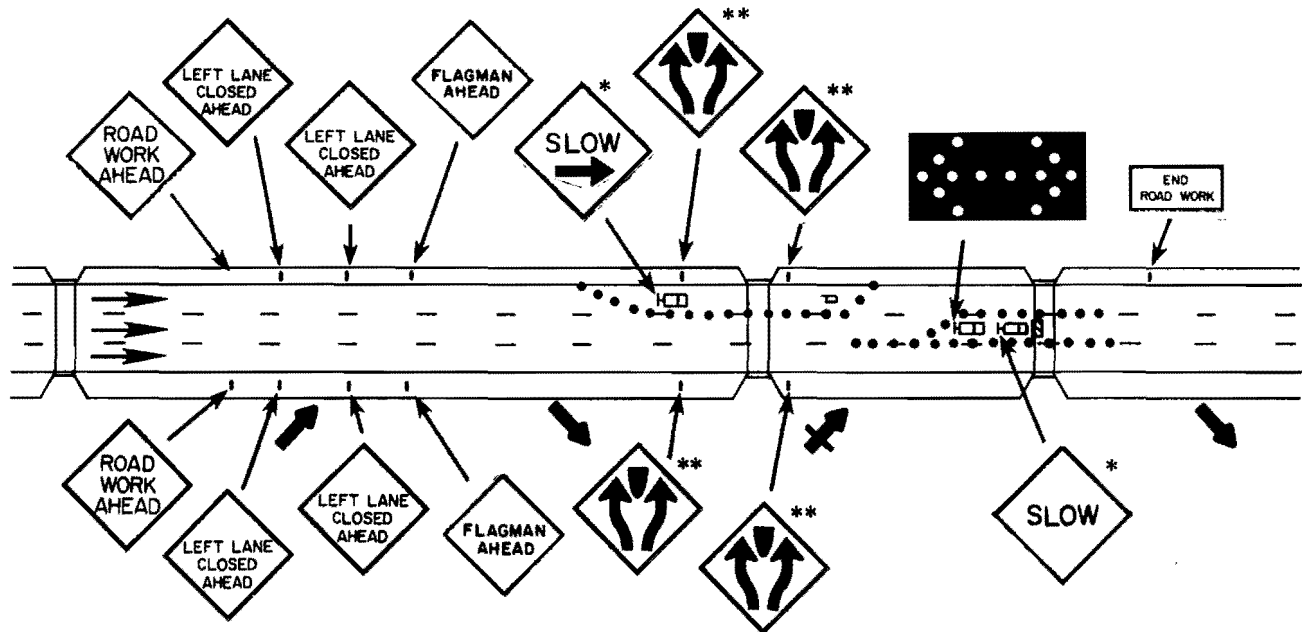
Traffic Control Strategy Used to Perform Center Lane Work on Sections of I-45 Without Shoulders
